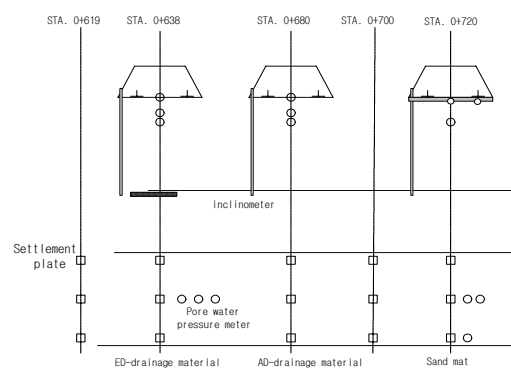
Instrumentation plan and cross-section/plane view of NKJ R-D
